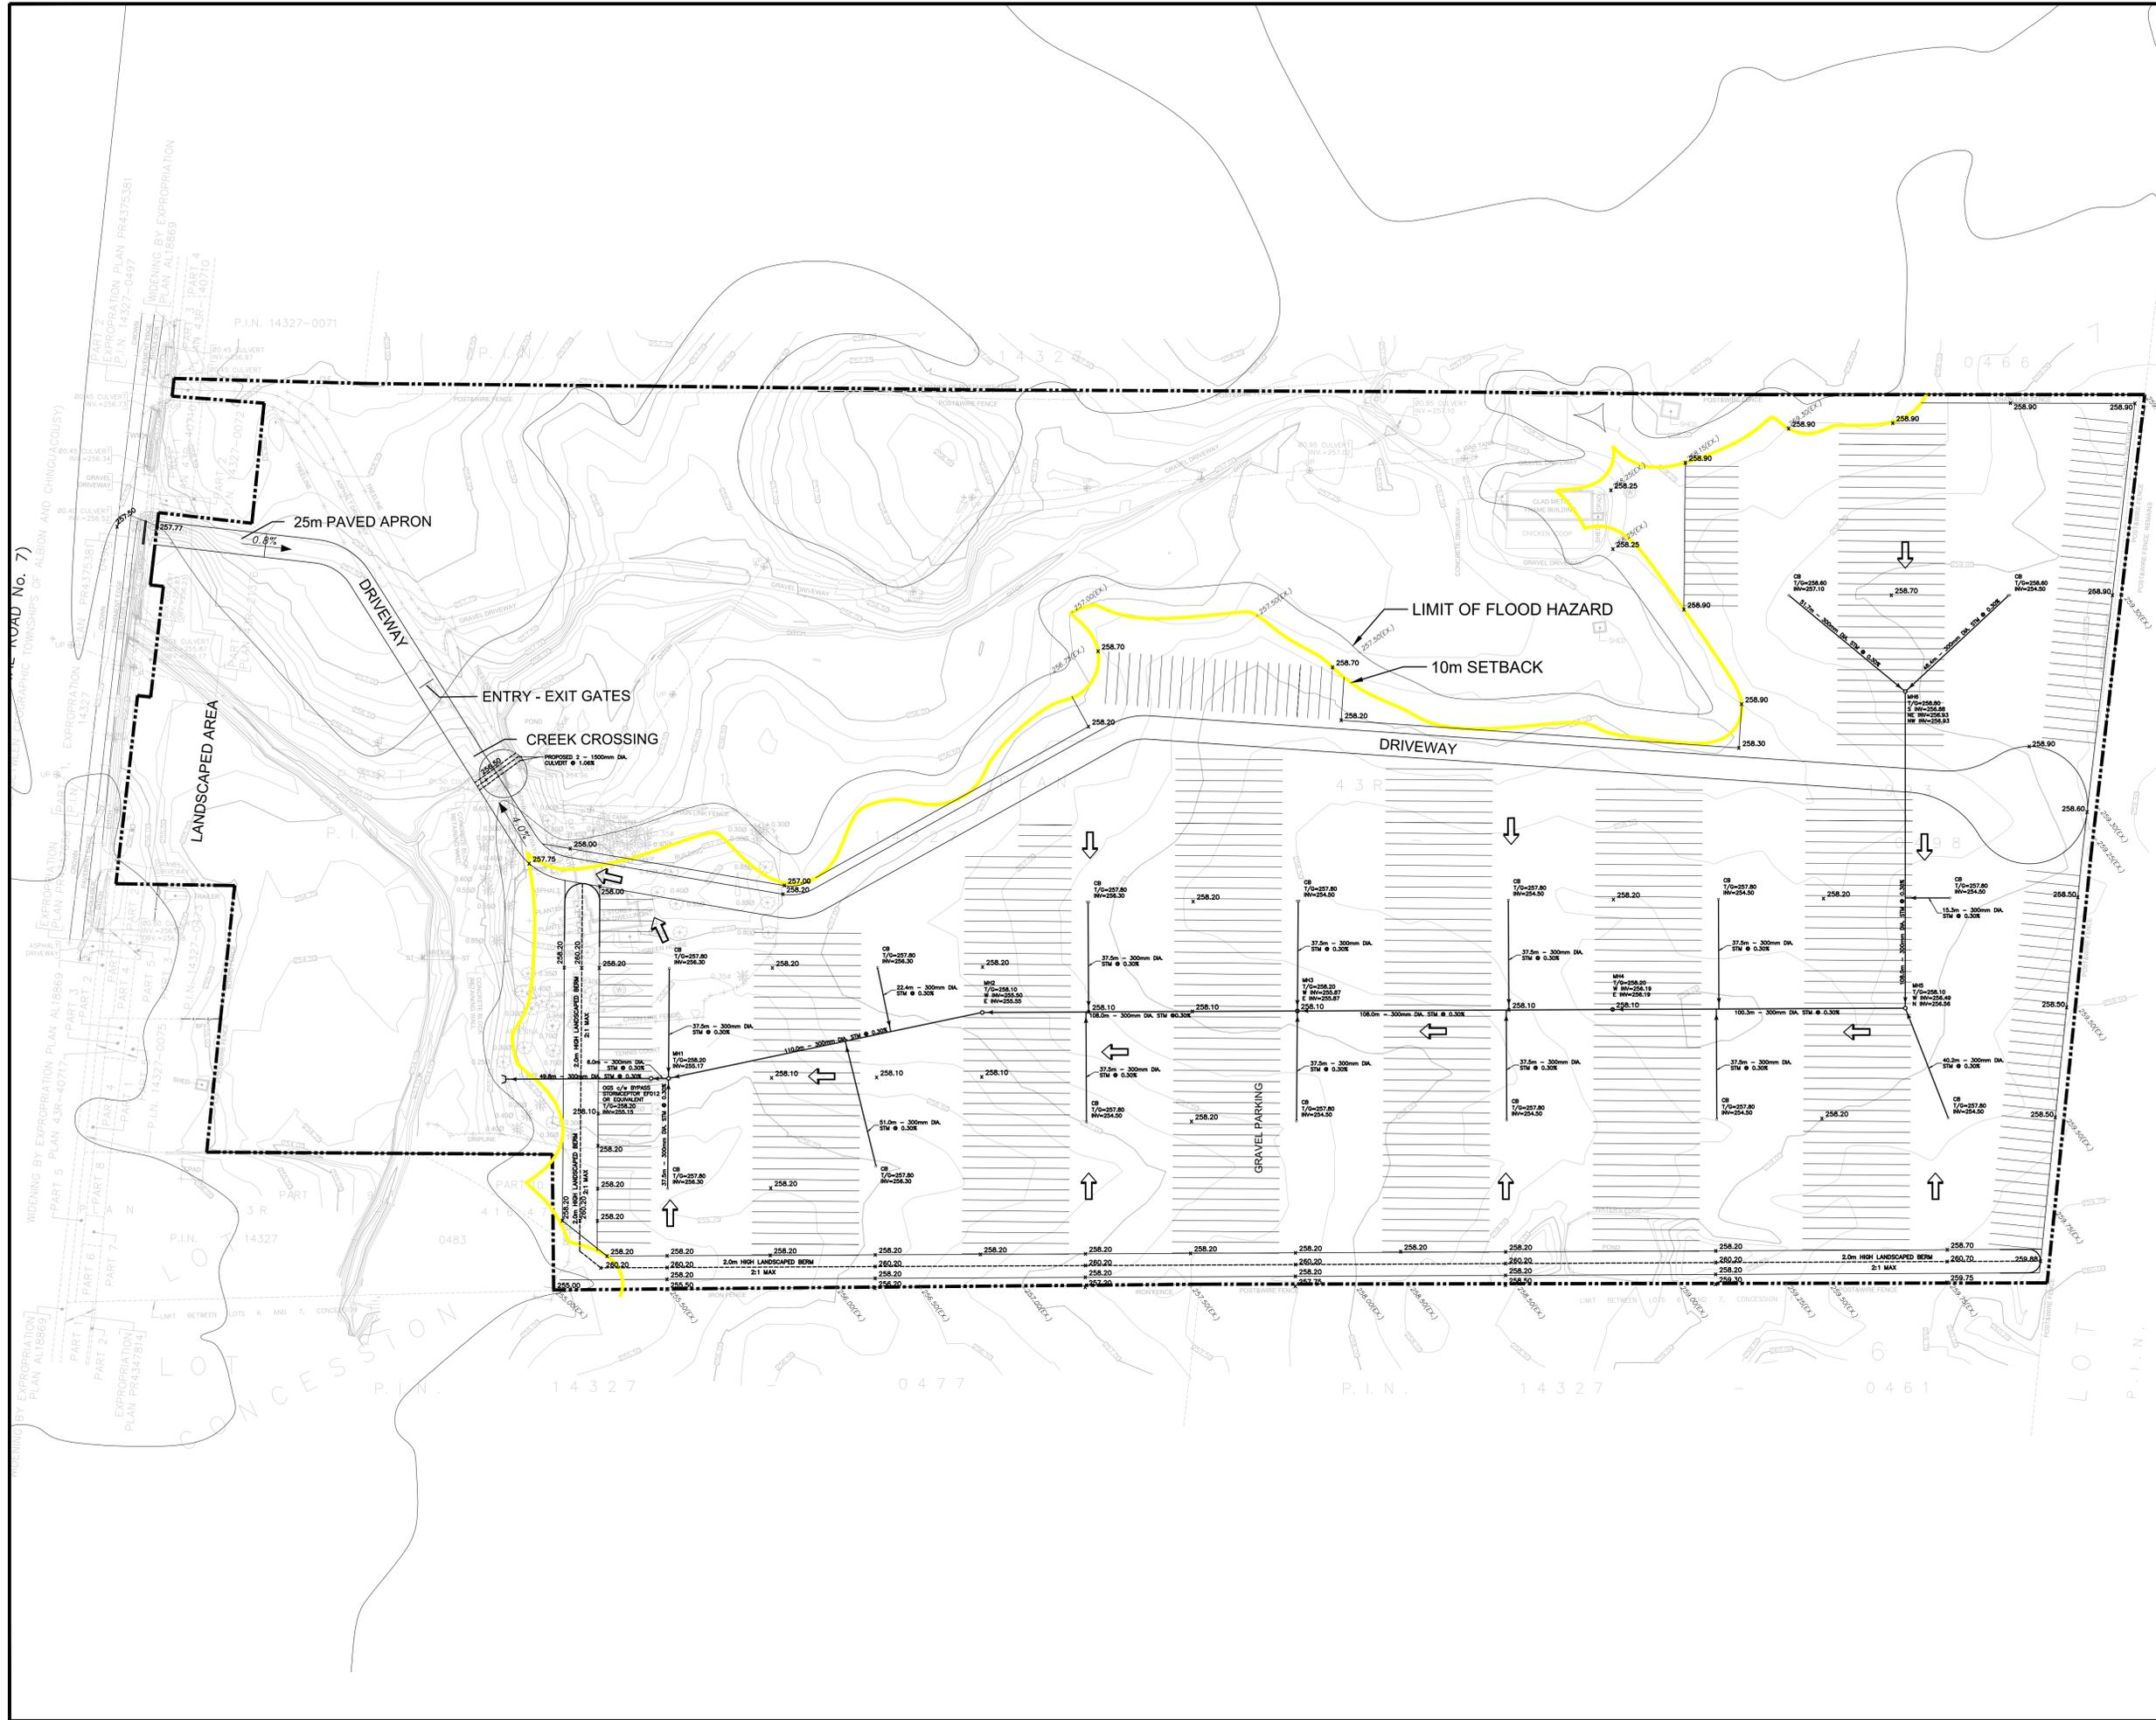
POST-DEVELOPMENT DRAINAGE AREA PLAN
